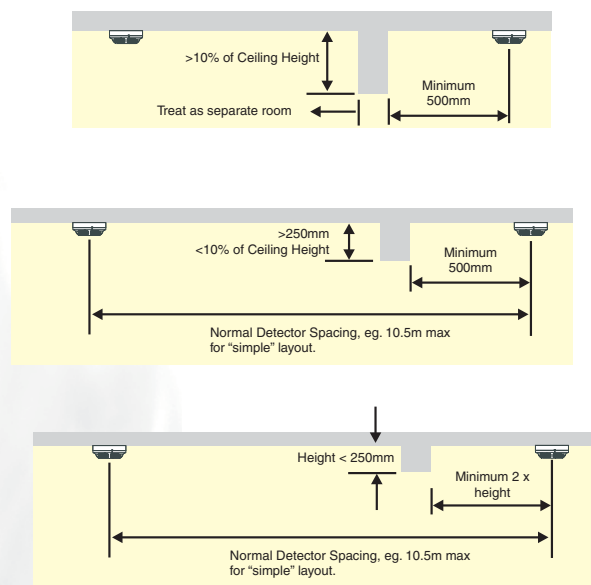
Detector Spacing around isolated ceiling obstructions
